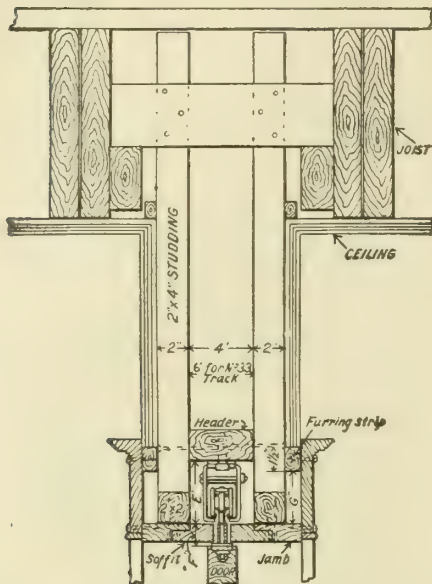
OVERHEAD CONSTRUCTION DETAILS AUDITORIUM DOOR HANGER
